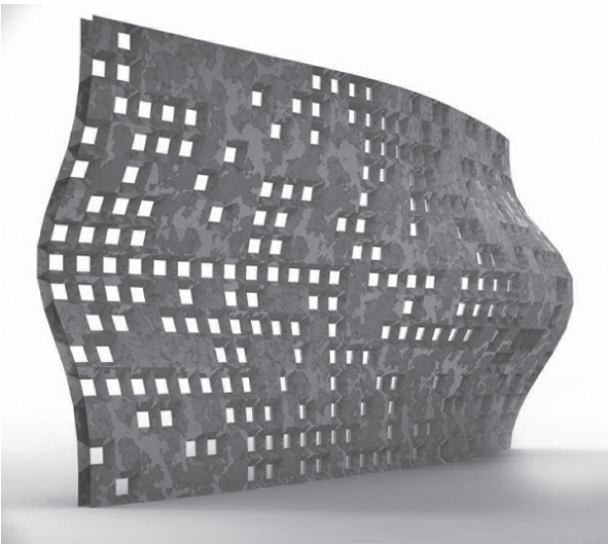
Facade, Front curtain wall, Stępkowski Radosław, Sopot College
